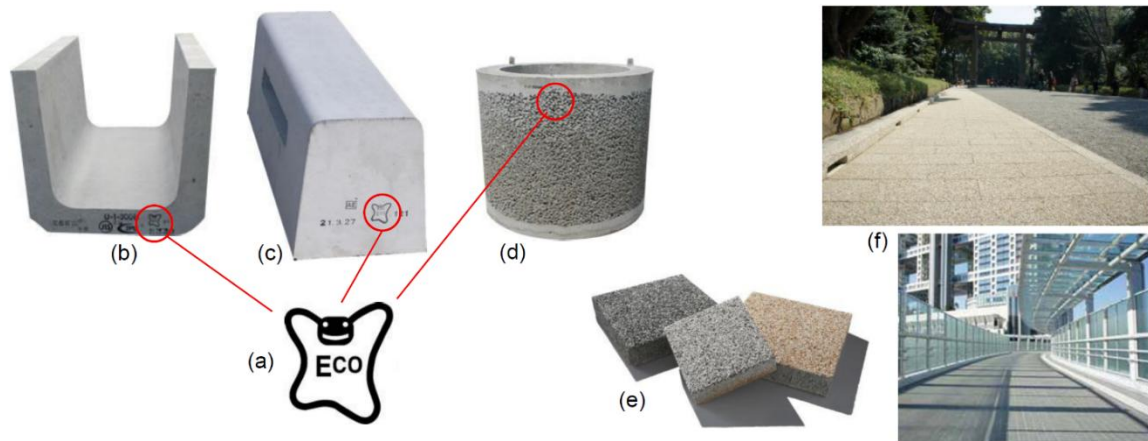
(a) Emblem of Eco-cement. (b) U-gutter. (c) Street drainage block. (d) Porous concrete product. (e) Permeable interlocking blocks manufactured with Eco-cement. (f) Examples of interlocking block installation. ©Taiheiyo Cement Corporation.
